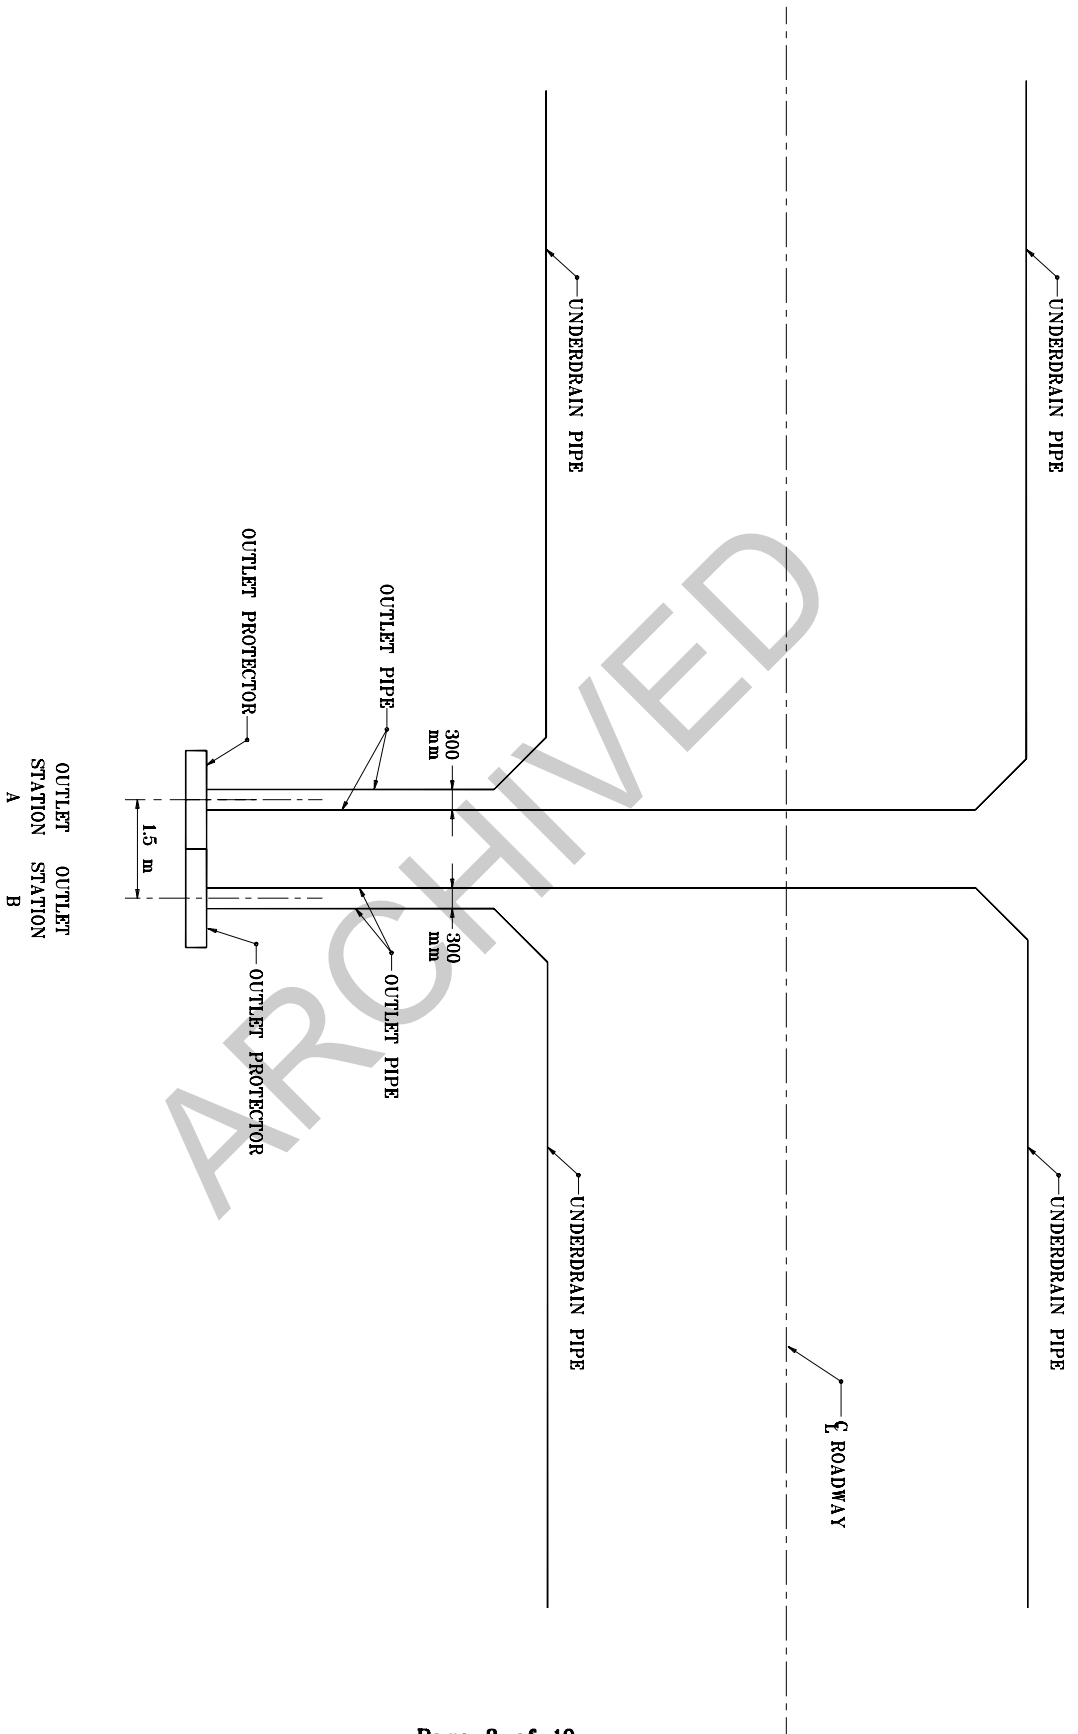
TYPICAL OUTLET PIPE INSTALLATION ACROSS ROADWAY
